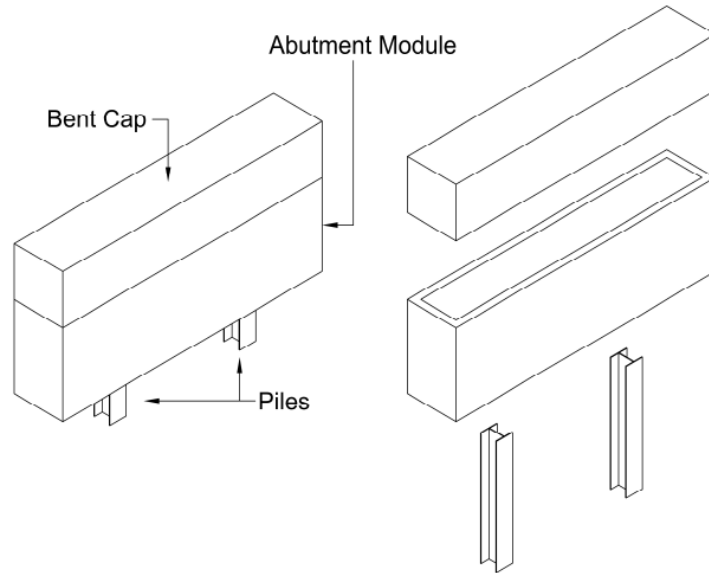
Pile Bent Cap with Hollow Wall Panel.* (Unlu, 2010)
